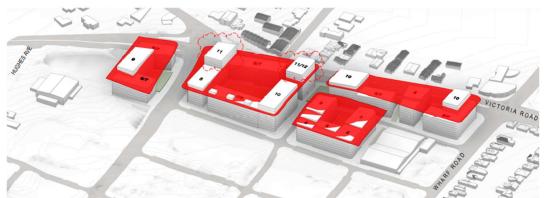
Proposed scheme - PLEP 2011 height (shown in red) & building above LEP in white (Source: AJC)
